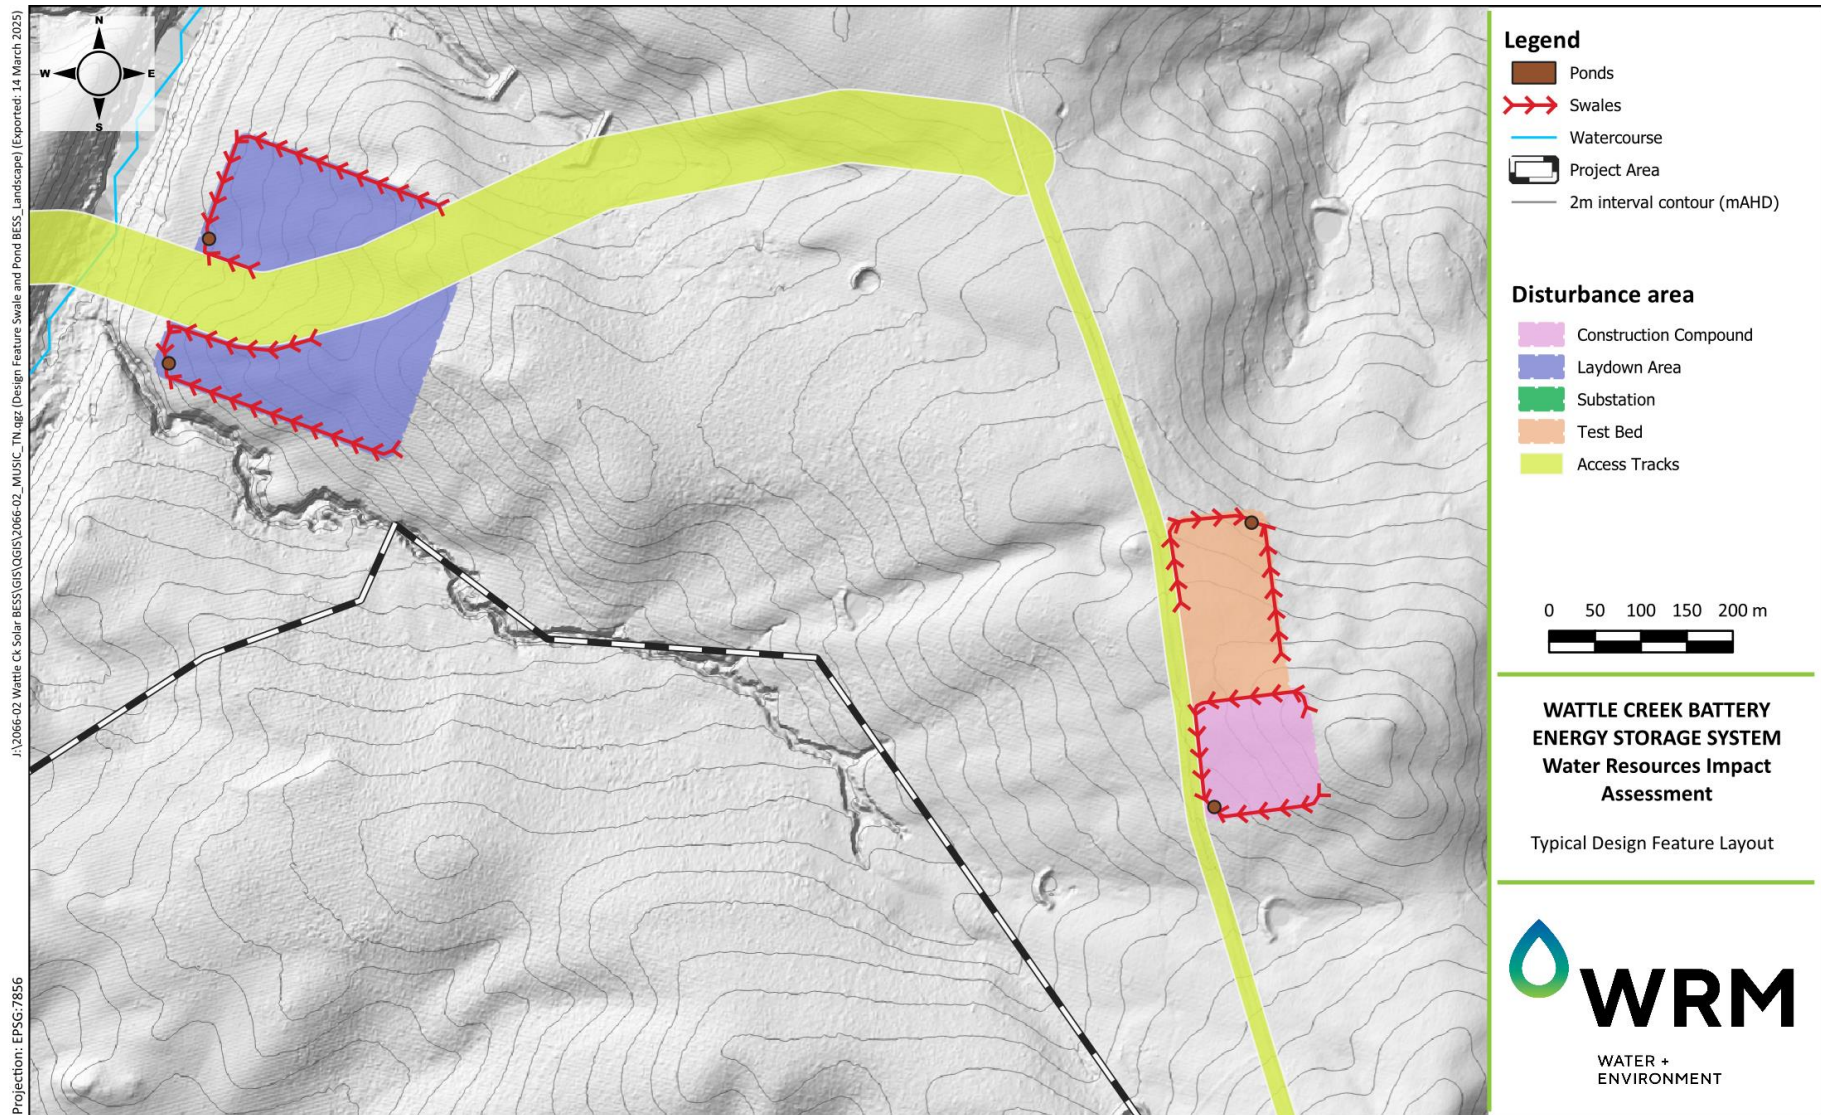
Typical Design Feature Swale and Pond layout 2
